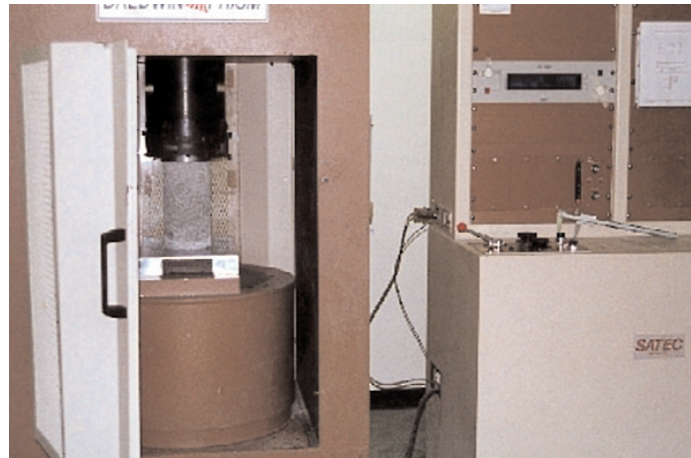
Compressive strength testing equipment. (IMG15528)
